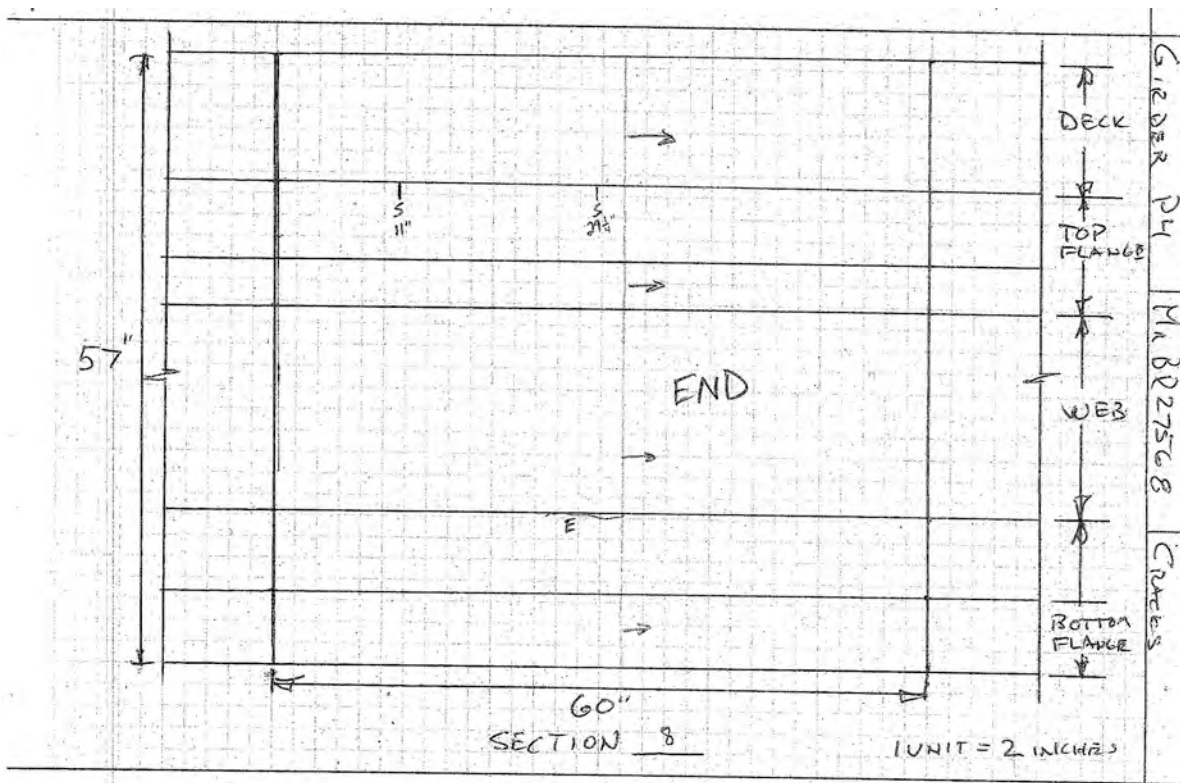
Girder P4 crack pattern – Section 8
